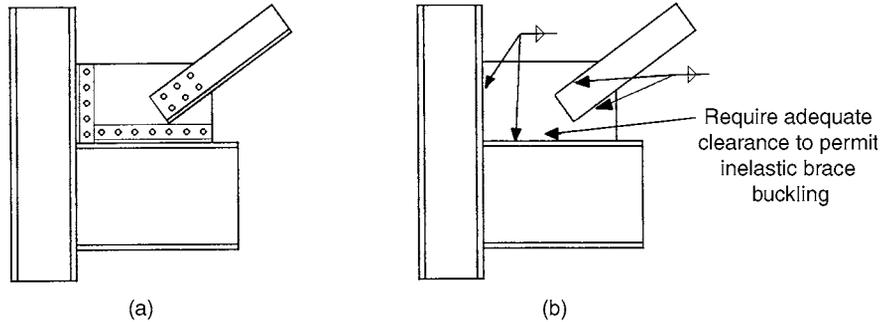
Typical gusset plate connections. (a) Entirely bolted connection. (b) Welded gusset plate connection with HSS tube brace such as may be used for seismic design.
